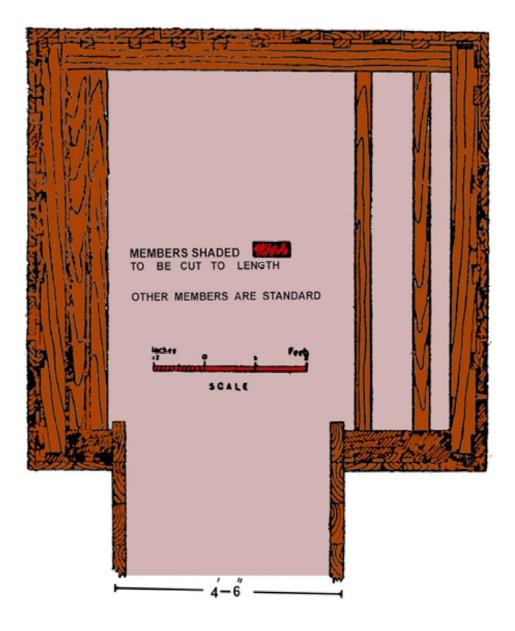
E1-3: Breaking Out a Heading from the Short Side of a 9 ft x 8 ft Shaft
